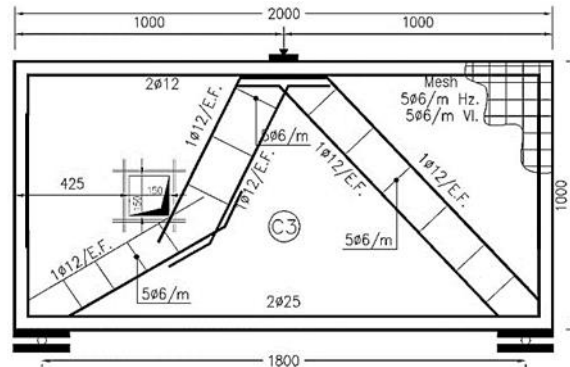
Reinforcement details of beam C3 (Type II). (Dimensions are in mm)
